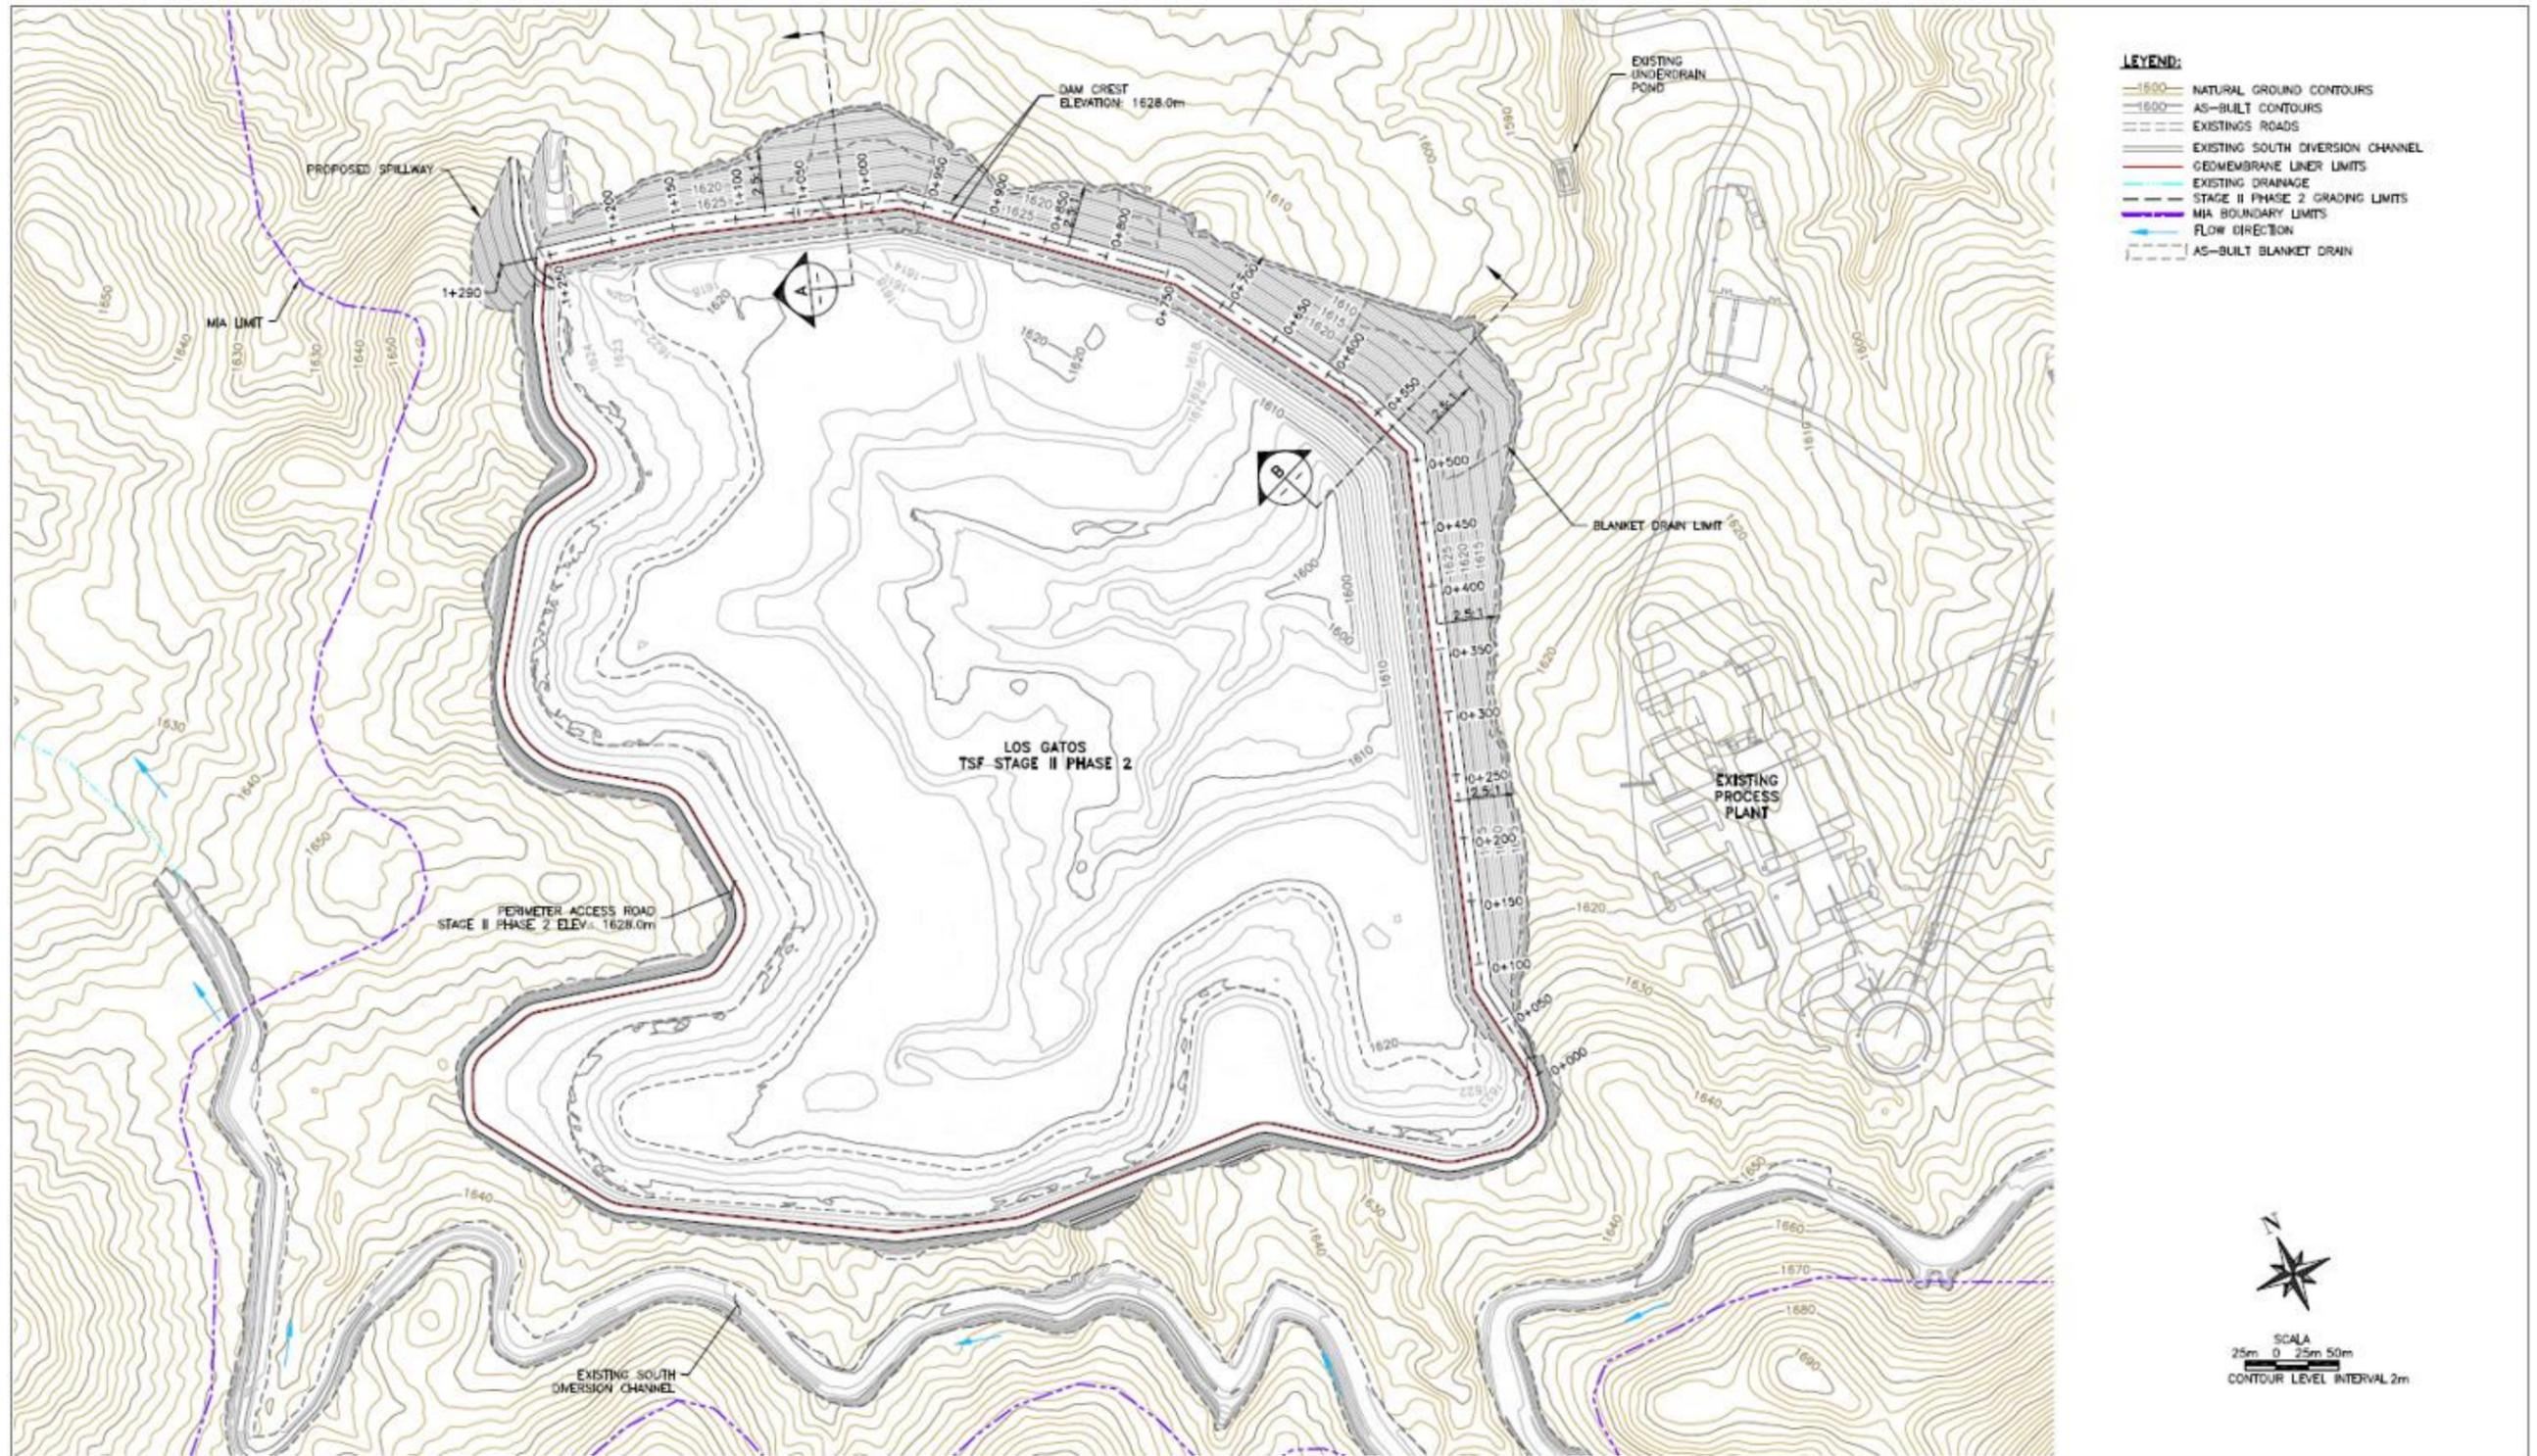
Stage II, Phase 2 Plan View (current elevation)
